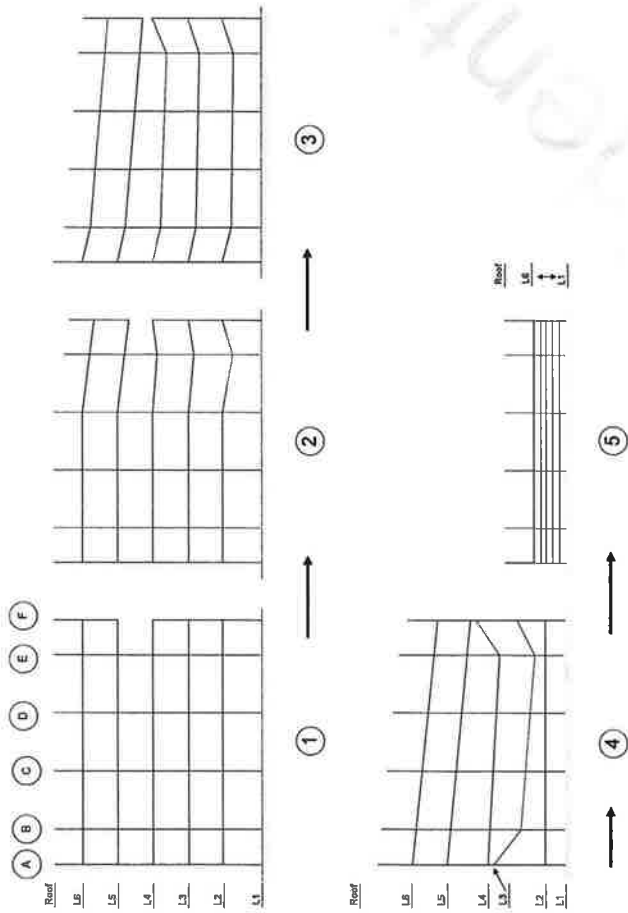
Possible progression of collapse from loss of column capacity on Line F is shown sequentially as follows: (1) Collapse of Line F columns above Level 4 leads to extra floor area being supported off columns on Line E; (2) The Line E columns begin to collapse under the extra load; (3) As the Line E columns sink additional floor area becomes supported on the Line D columns which in turn begin to collapse, causing an eastward tilt in the upper levels; (4) The upper levels then hit the Level 4 Line F; (5) The collapse completes with all floors laying on top of each other. Note that collapse is also spreading in the north-south direction simultaneously to this as shown in Figure 12.
